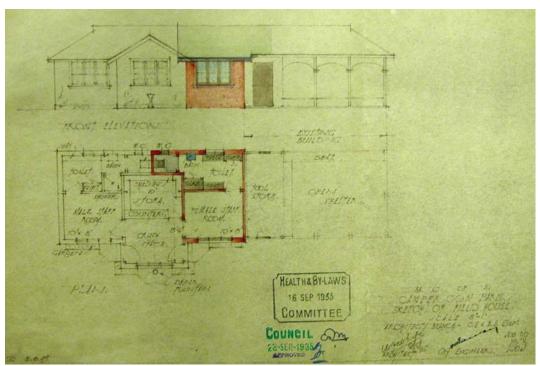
A 1935 plan for the extension of The Field House adjoining the playground. Source: City of Sydney Archives, 4436/33.
